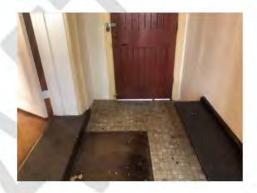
View of tiled flooring within entry porch to Paddington Church of Christ.
